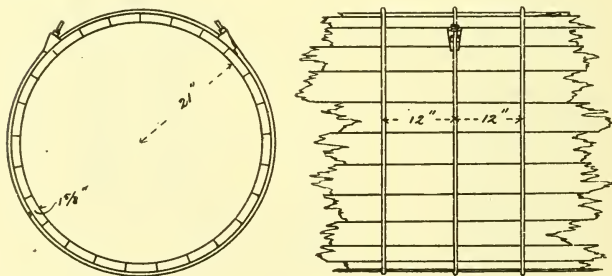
SECTION OF CONDUIT, SHOWING METHOD OF CONSTRUCTION.
